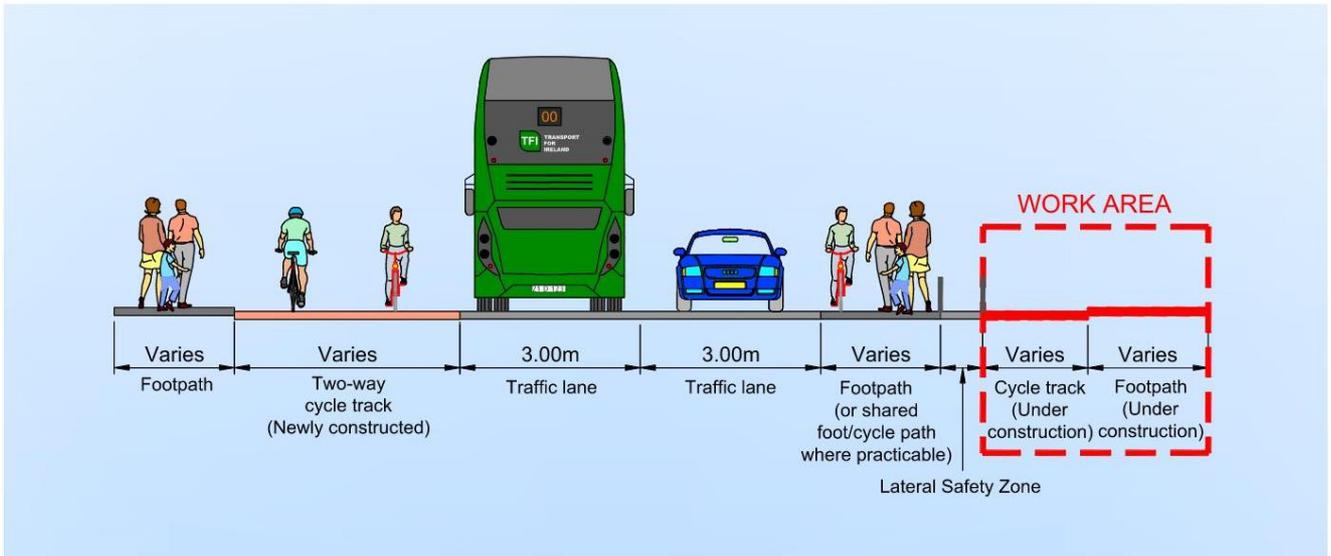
Traffic Management Cross Section, Section 4a – Stage 2
